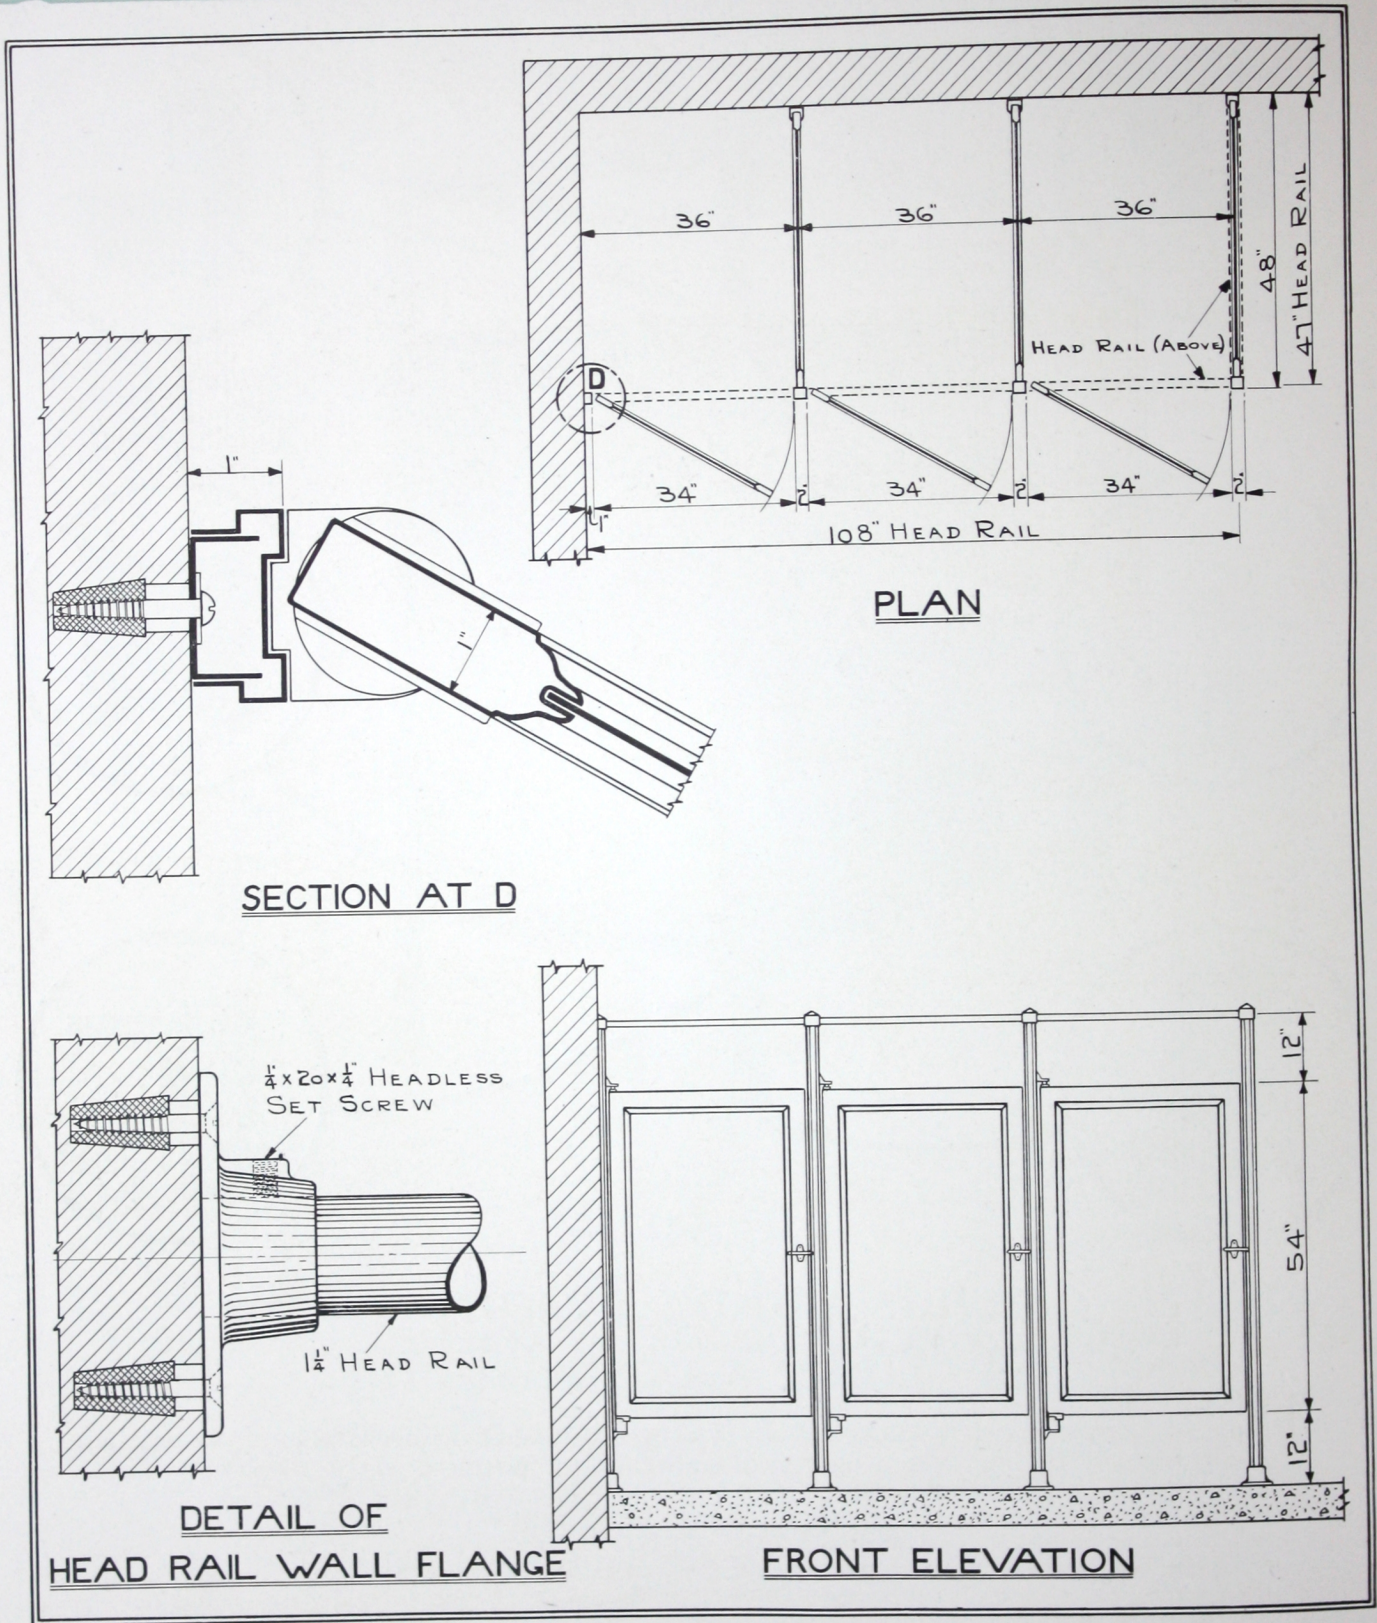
shows adjustable wall channel and cross-section of drawn hollow metal stile and rail.
